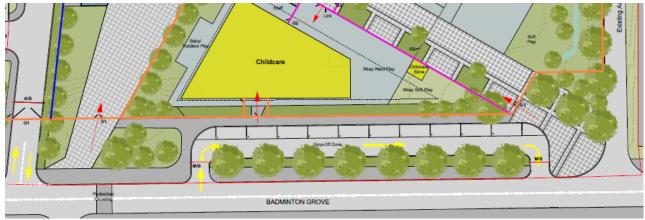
(above) showing proposed drop-off zone to site frontage (Badminton Grove)
